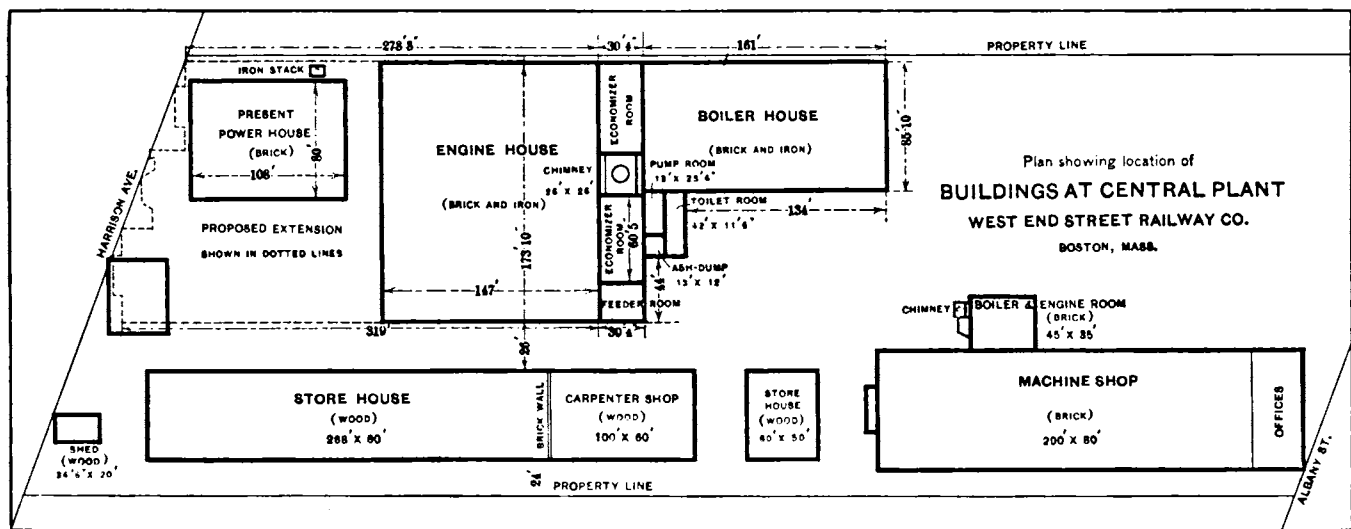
GENERAL PLAN OF THE BUILDINGS.
